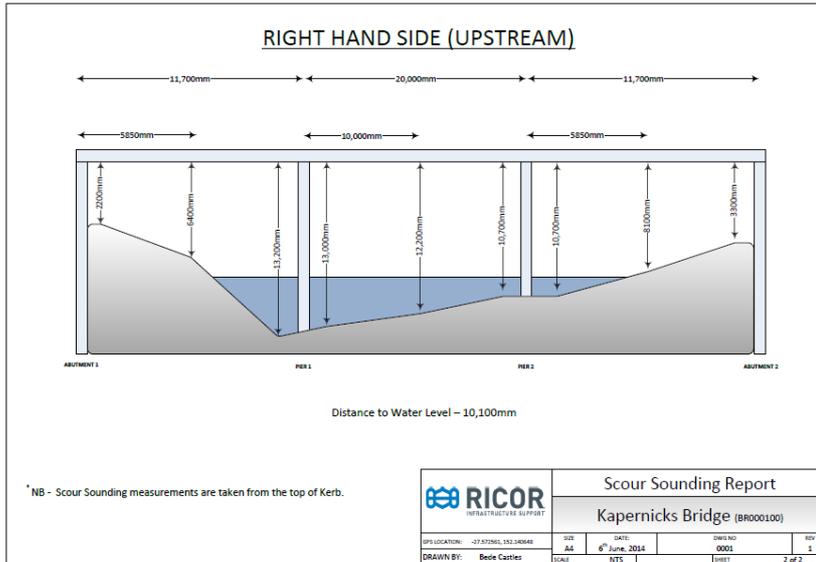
KAPERINICK BRIDGE UPSTREAM
